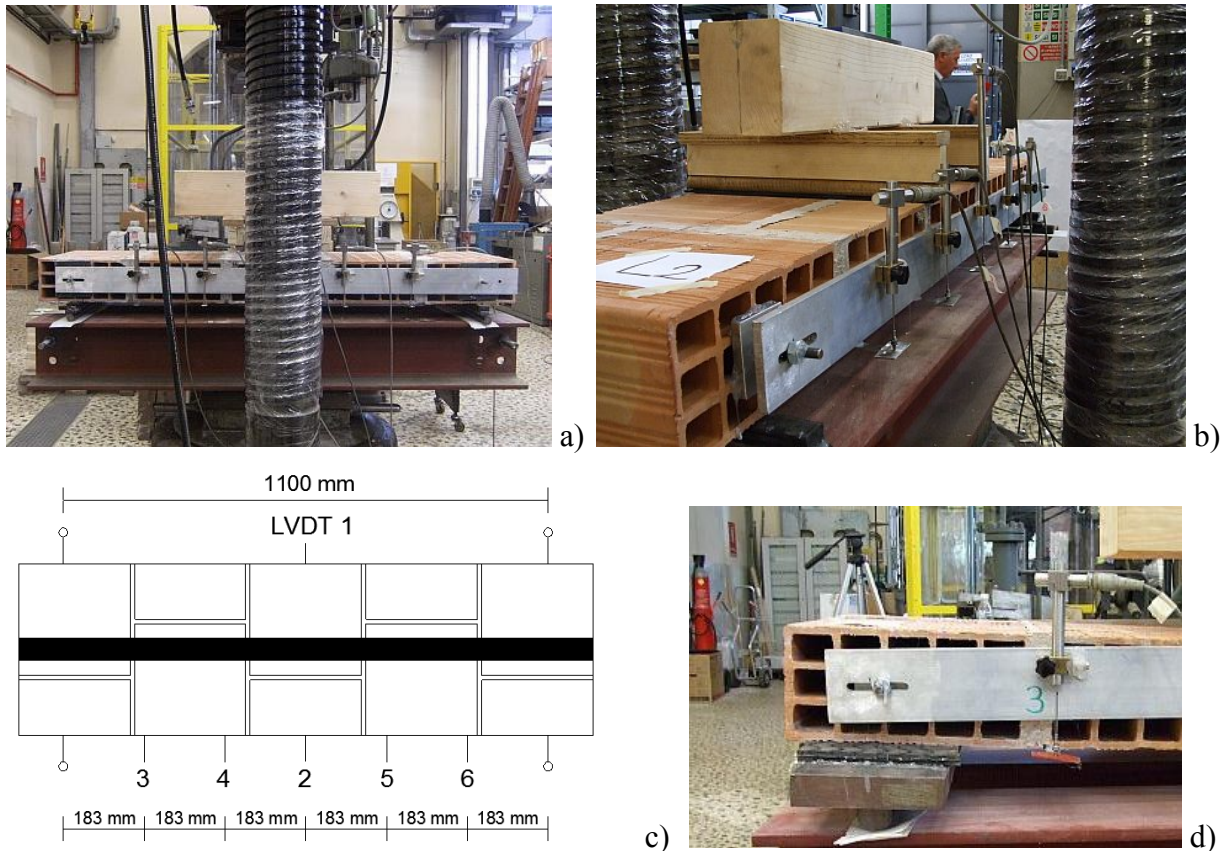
Test set-up: frontal (a) and lateral (b) view; lay-out of transducers (c) and detail of supports and LVDT positioning (d).
